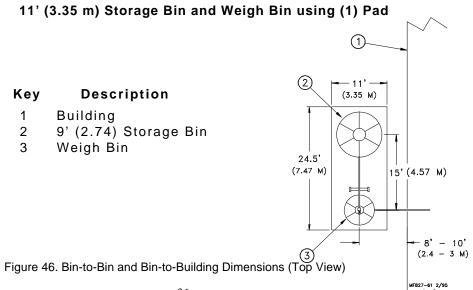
Bin-to-Bin and Bin-to-Building Dimensions (Top View)
